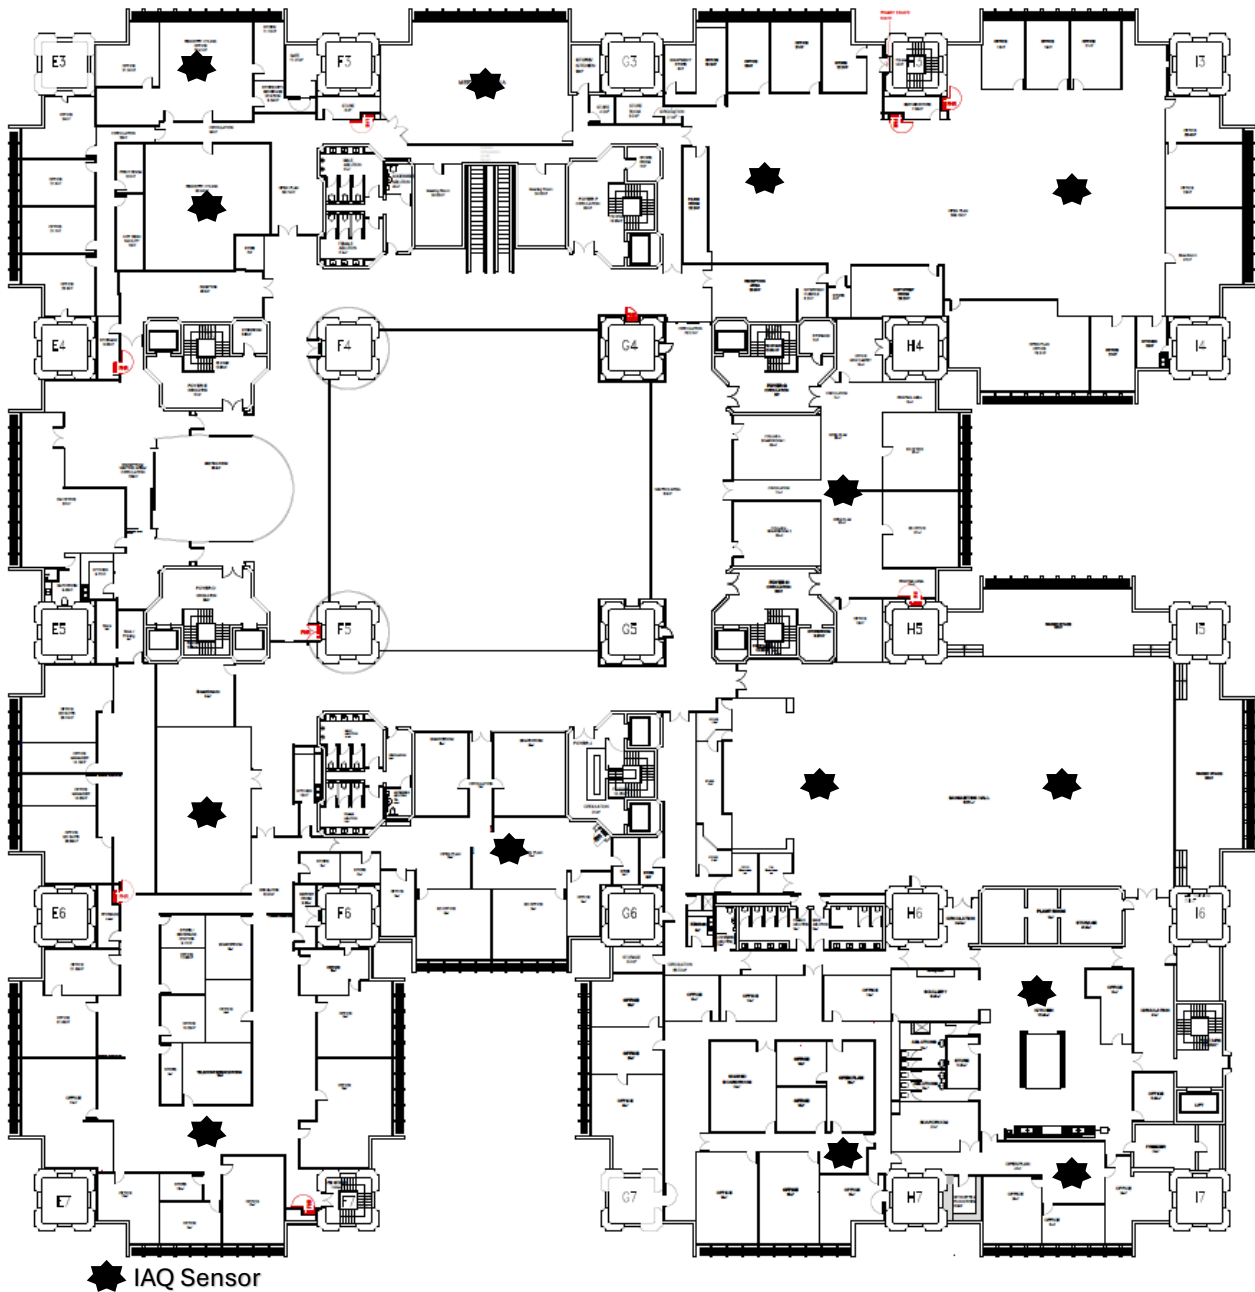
Podium Building proposed sensor positioning 5th floor (13)
